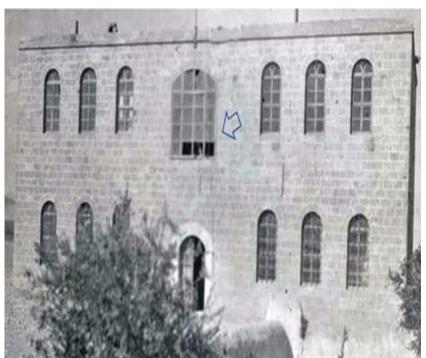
Wooden joinery found in a similar building sample (Former Kızıltepe Government Building)
